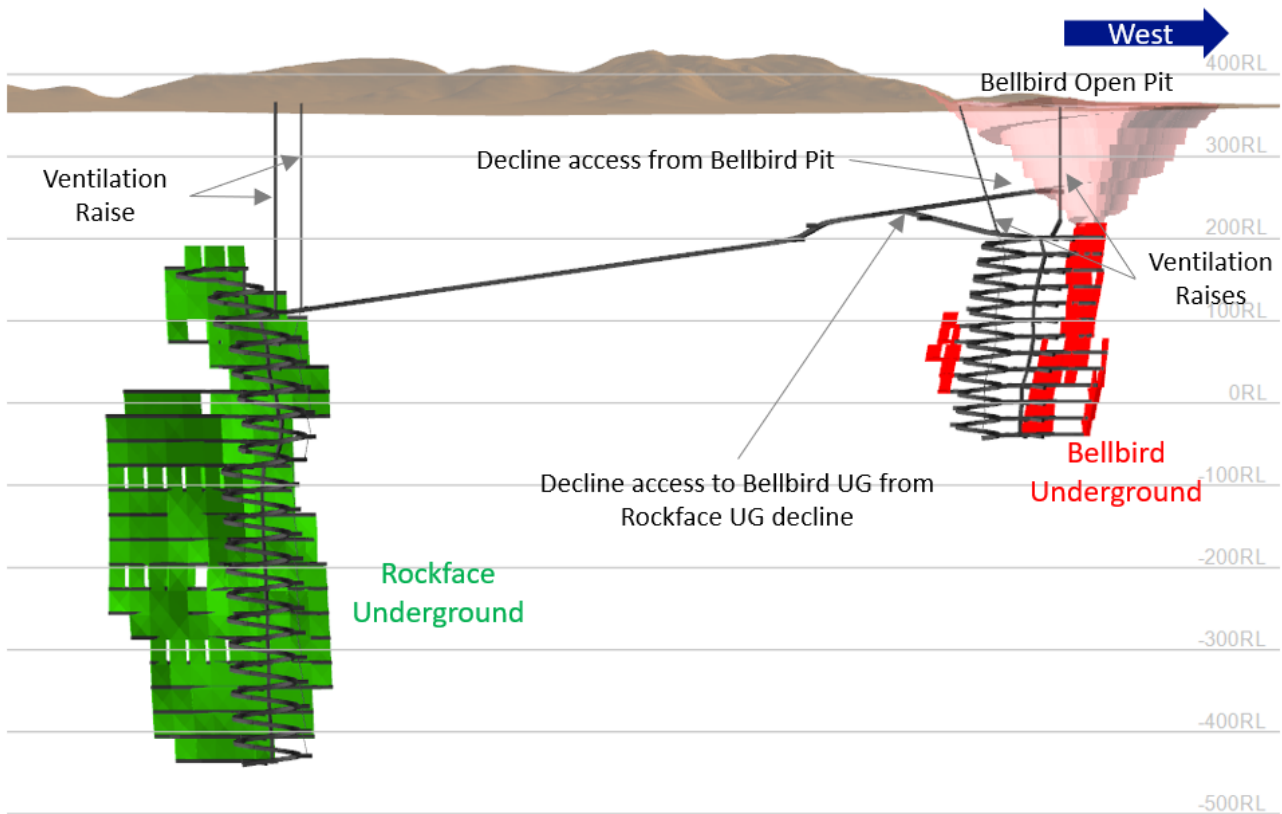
Bellbird Open-cut, Rockface Underground & Bellbird Underground Mine Layout – Looking South
